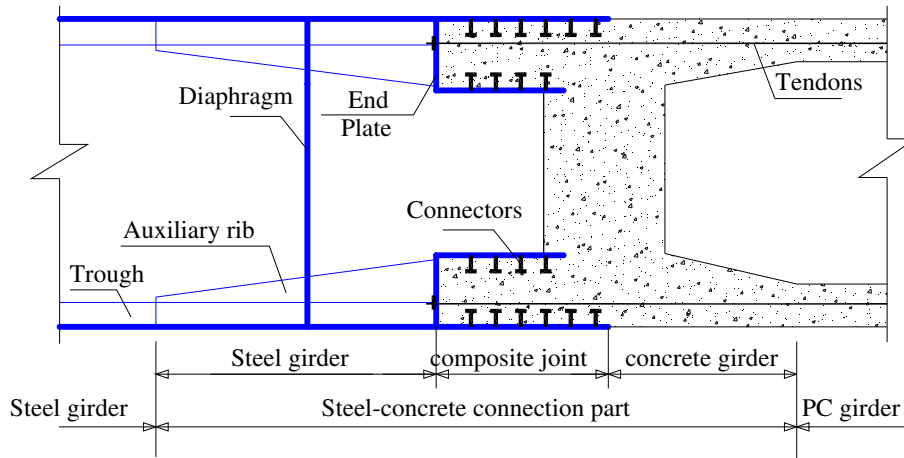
Side view of steel-concrete joint in hybrid girder.
